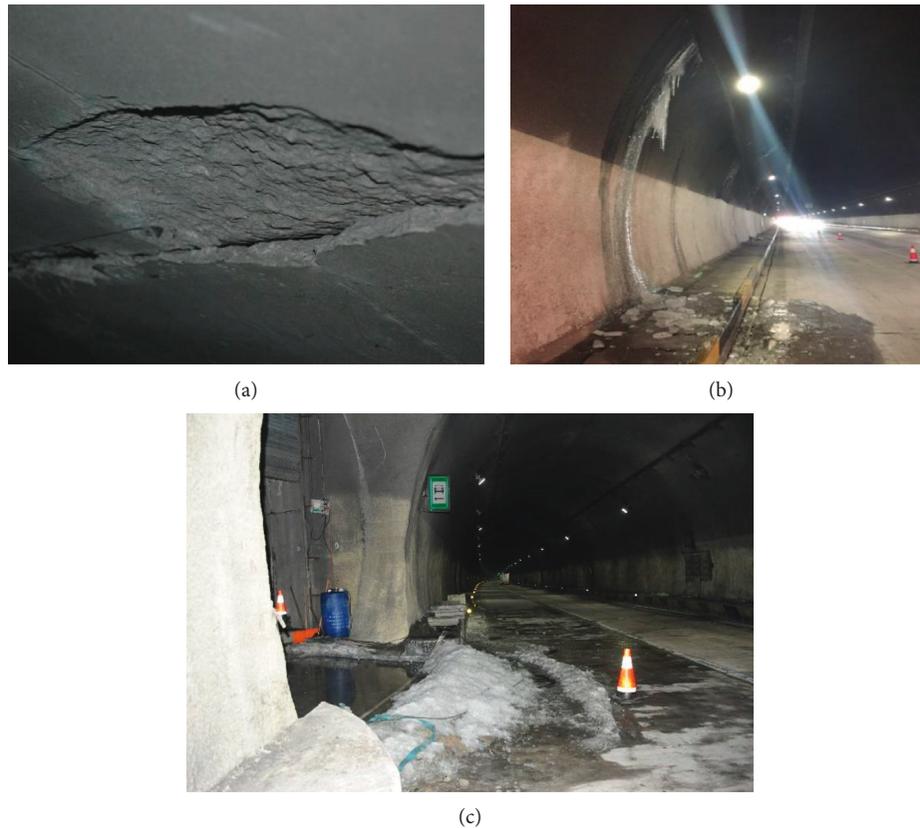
Tunnel frost damage in cold region. (a) Tunnel lining concrete peeling off. (b) Tunnel leakage and icicles. (c) Tunnel pavement icing.
